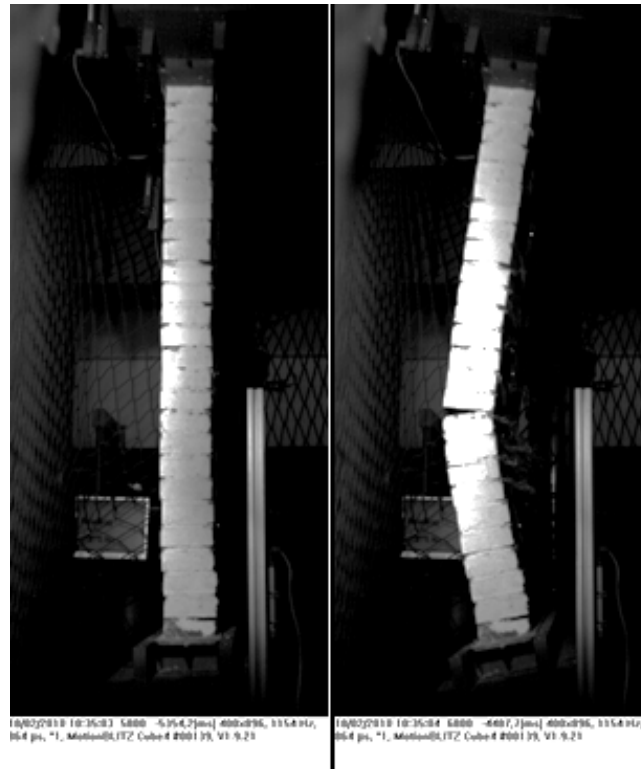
148 Failure of the wall W#10. Opening of a horizontal mortar joint below mid-height
